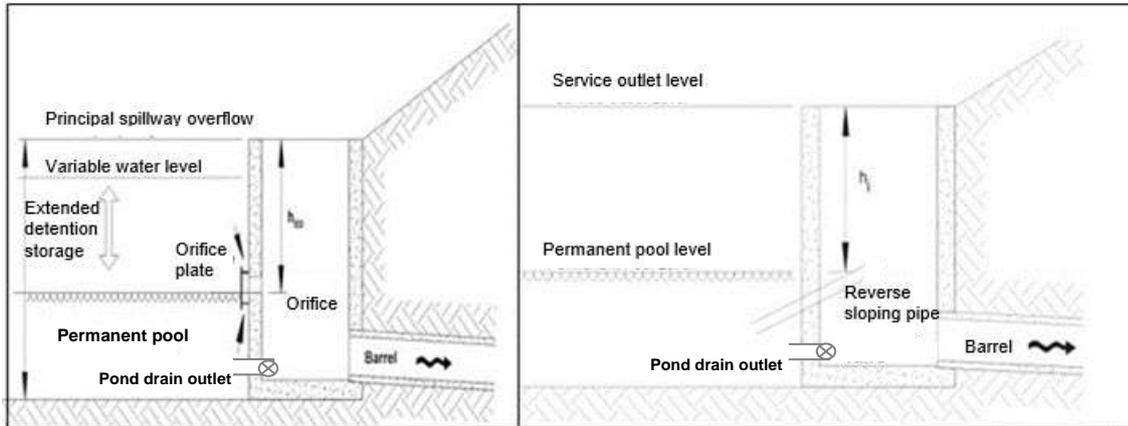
Schematic of extended detention outlet structures¹²¹
